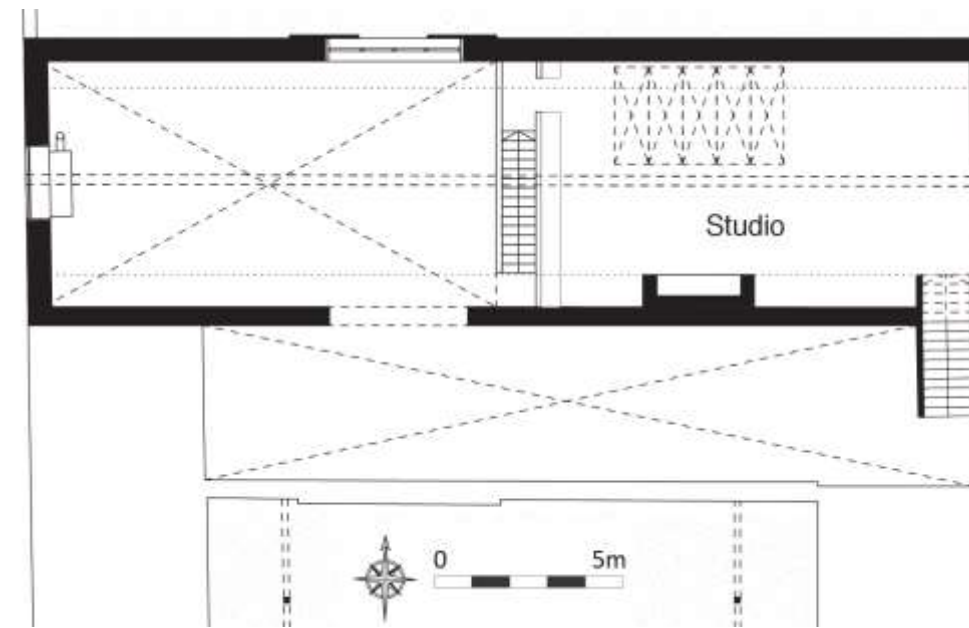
Barn complex proposed ground and mezzanine floors (scale 1:200)
